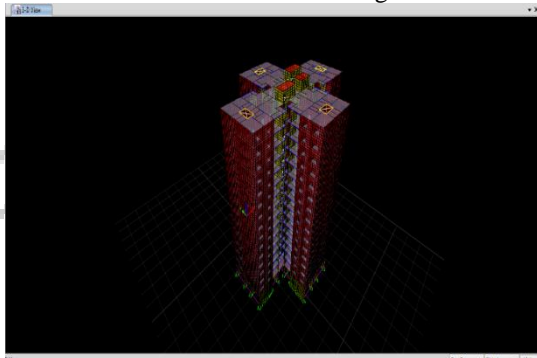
3D Model Shear Wall Structure (Model M1)
